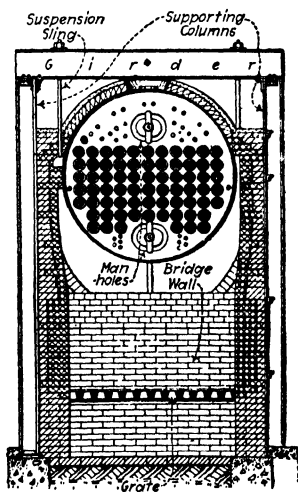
Cross-sectional elevation through furnace of horizontal return-tubular boiler.
